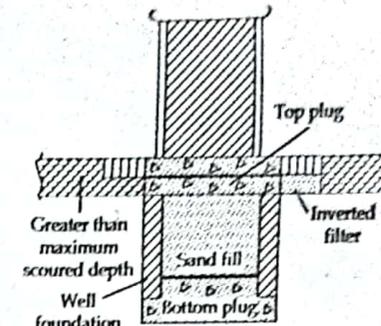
Cross-section of divide wall beyond Pucca floor
